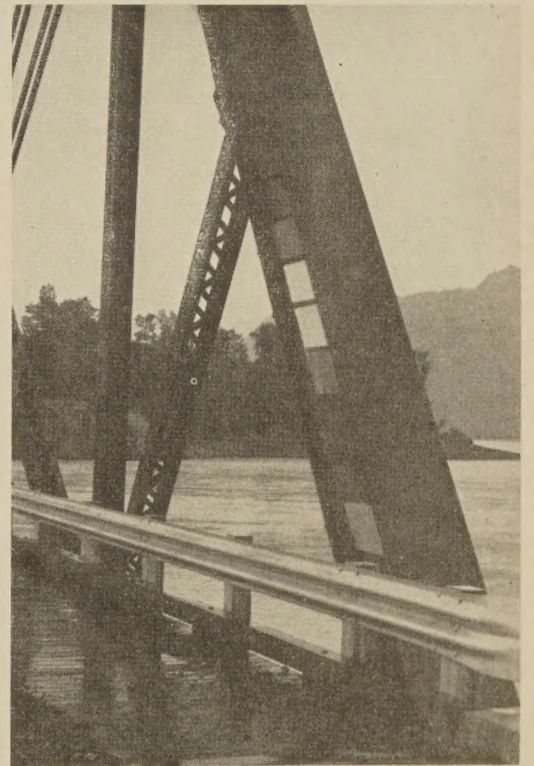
Exposure E at Mile 28 Bridge faced south and protected.
